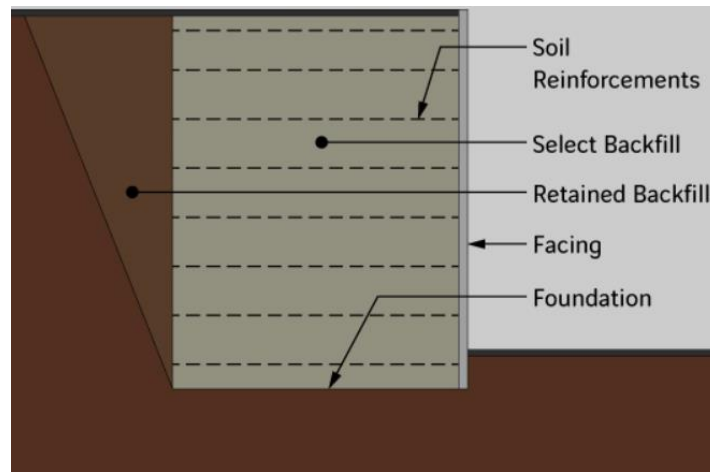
Mechanical Stabilized Earth Retaining Wall
